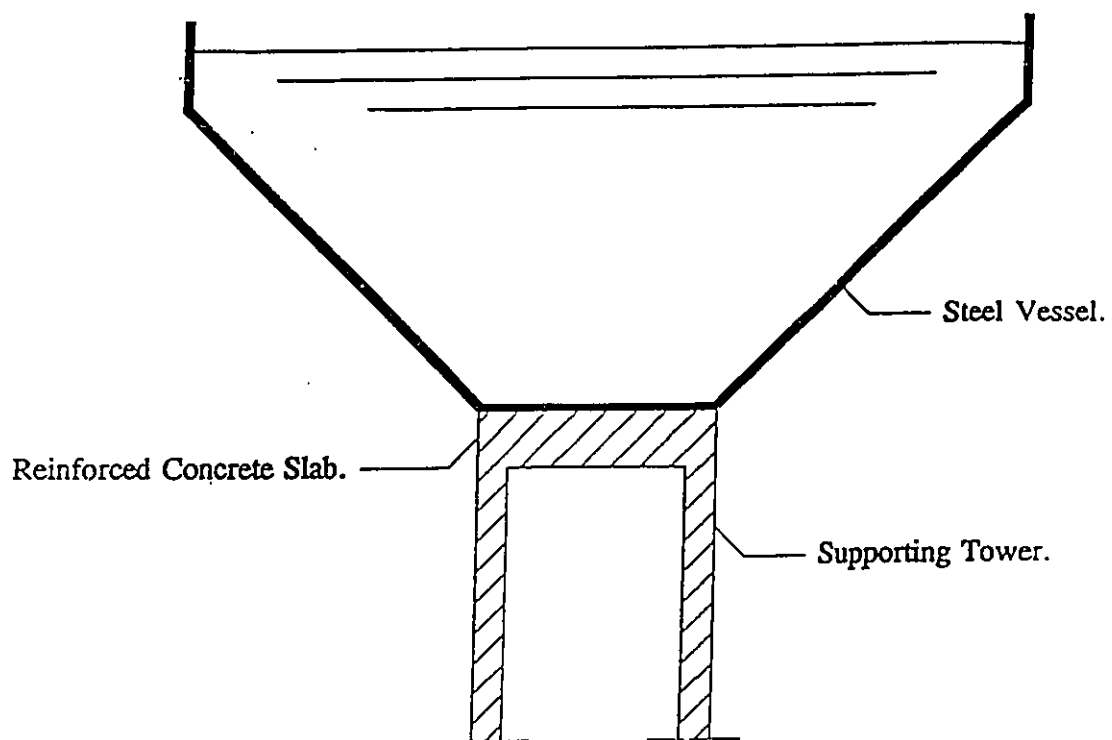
Cross Sectional Elevation of Elevated Conical Tanks.
